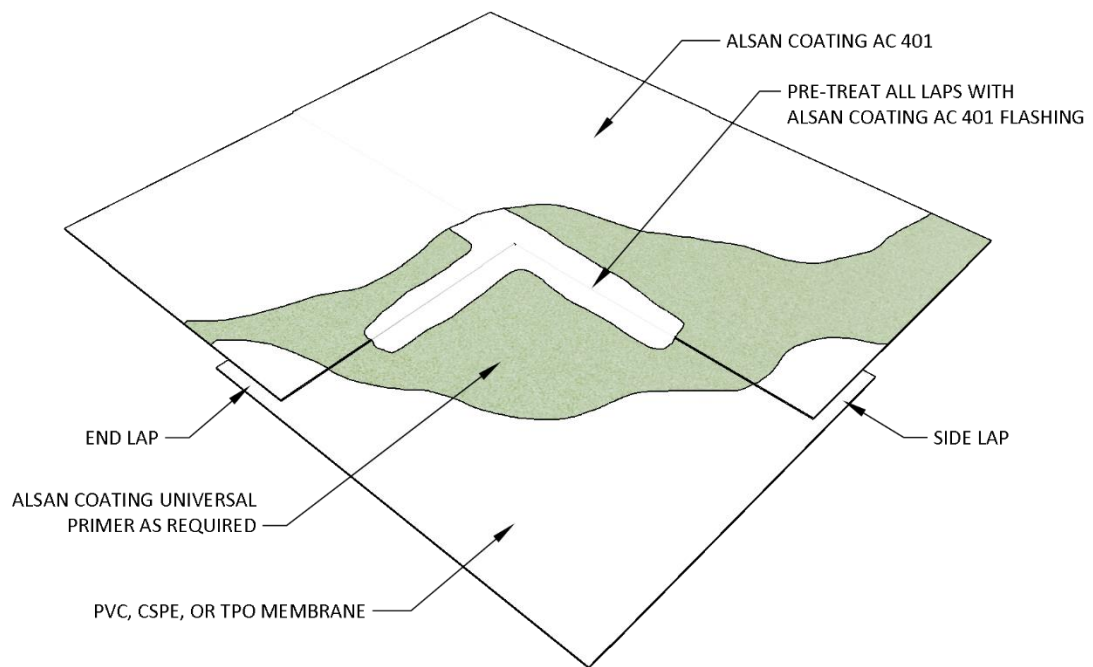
Acrylic Roof Coating Over TPO/CSPE/PVC, Side/End Laps
